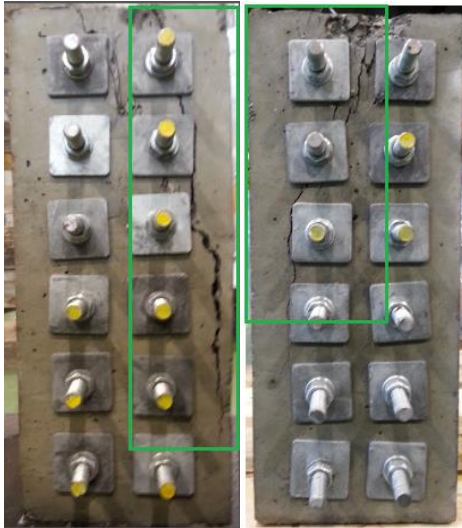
Critical cracks in reinforced (left) and unreinforced (right) specimens
